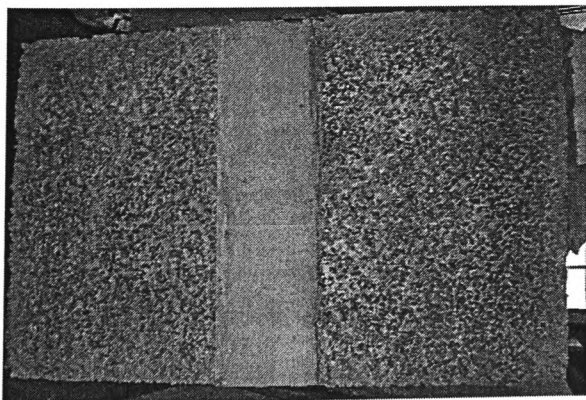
10 mm concrete slab with 10 cm wide concrete stripe
